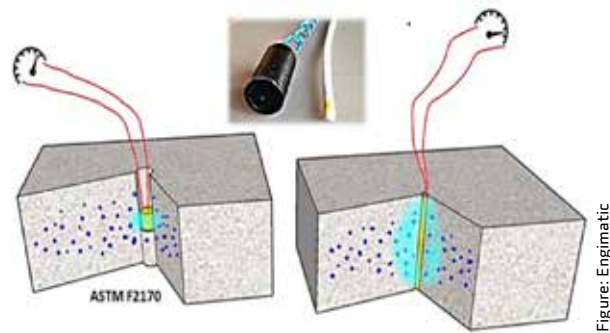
Moisture measurement of concrete floor slabs in accordance with ASTM F2170 and using CHS
